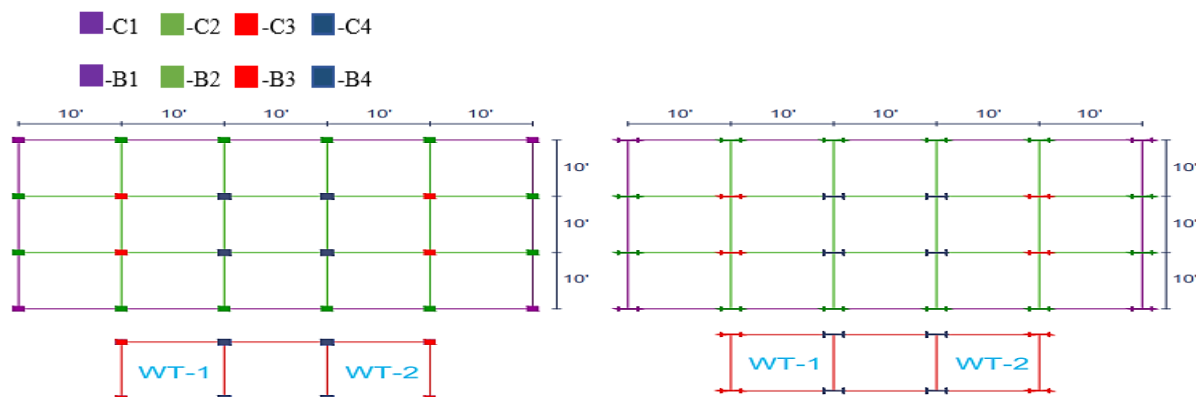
Floor-plan of frame sections (RCC and STEEL).
